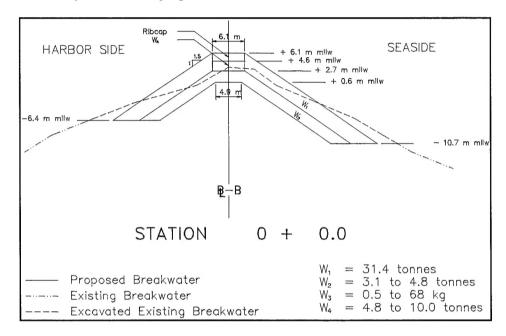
Typical cross section of proposed breakwater in previous study (Smith 1998)
